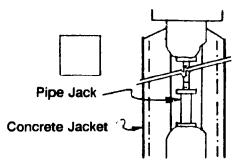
PARTIAL REPLACEMENT OF PILE WITH PIPE JACK AND CONCRETE JACKET'
